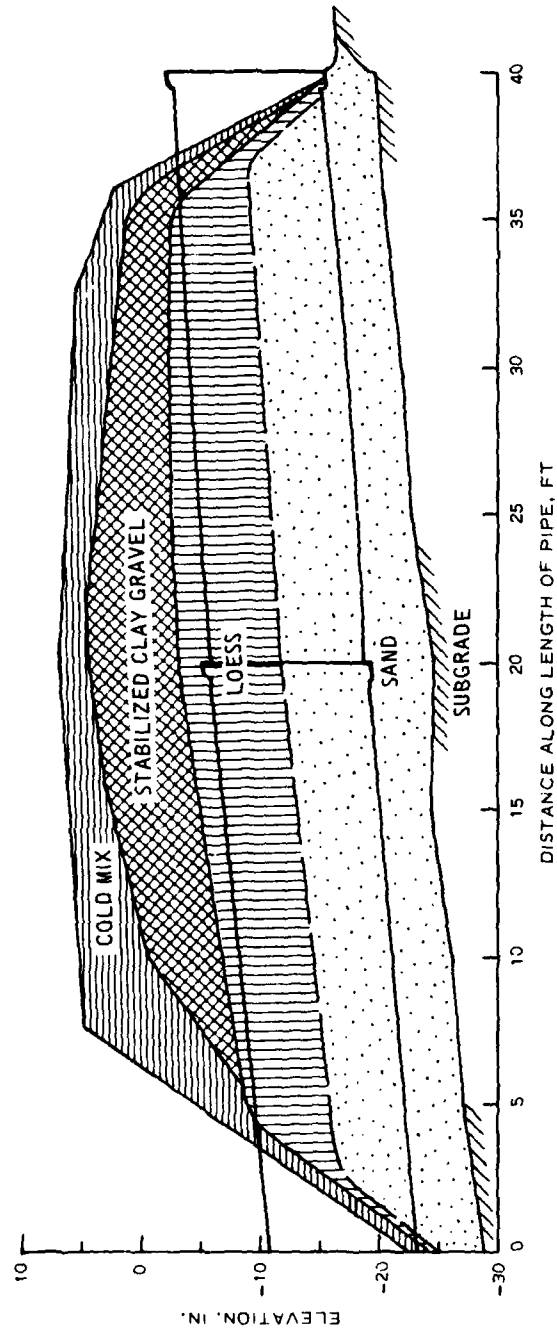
Details of installation of 12-in. PVC pipe at Test Site No. 3
